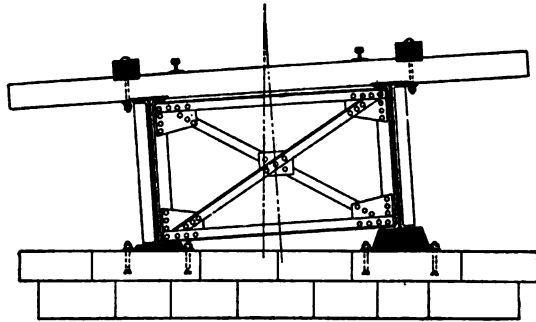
ELEVATION BY RAISING OUTSIDE GIRDER.
